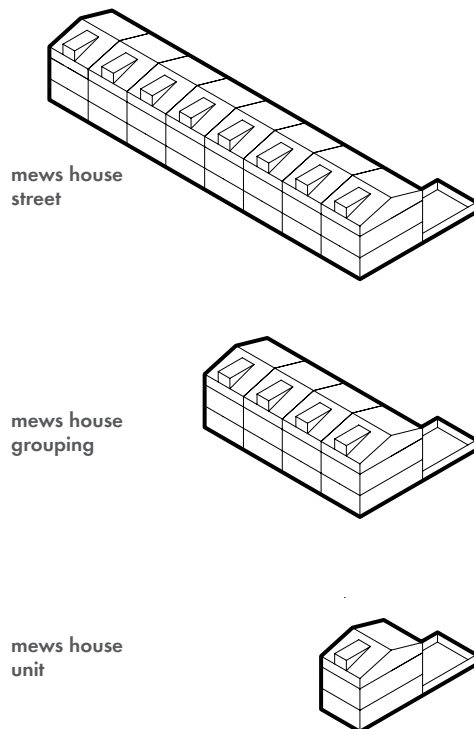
Diagram to illustrate a mews house as a single unit, repeated to form a group or street terrace
